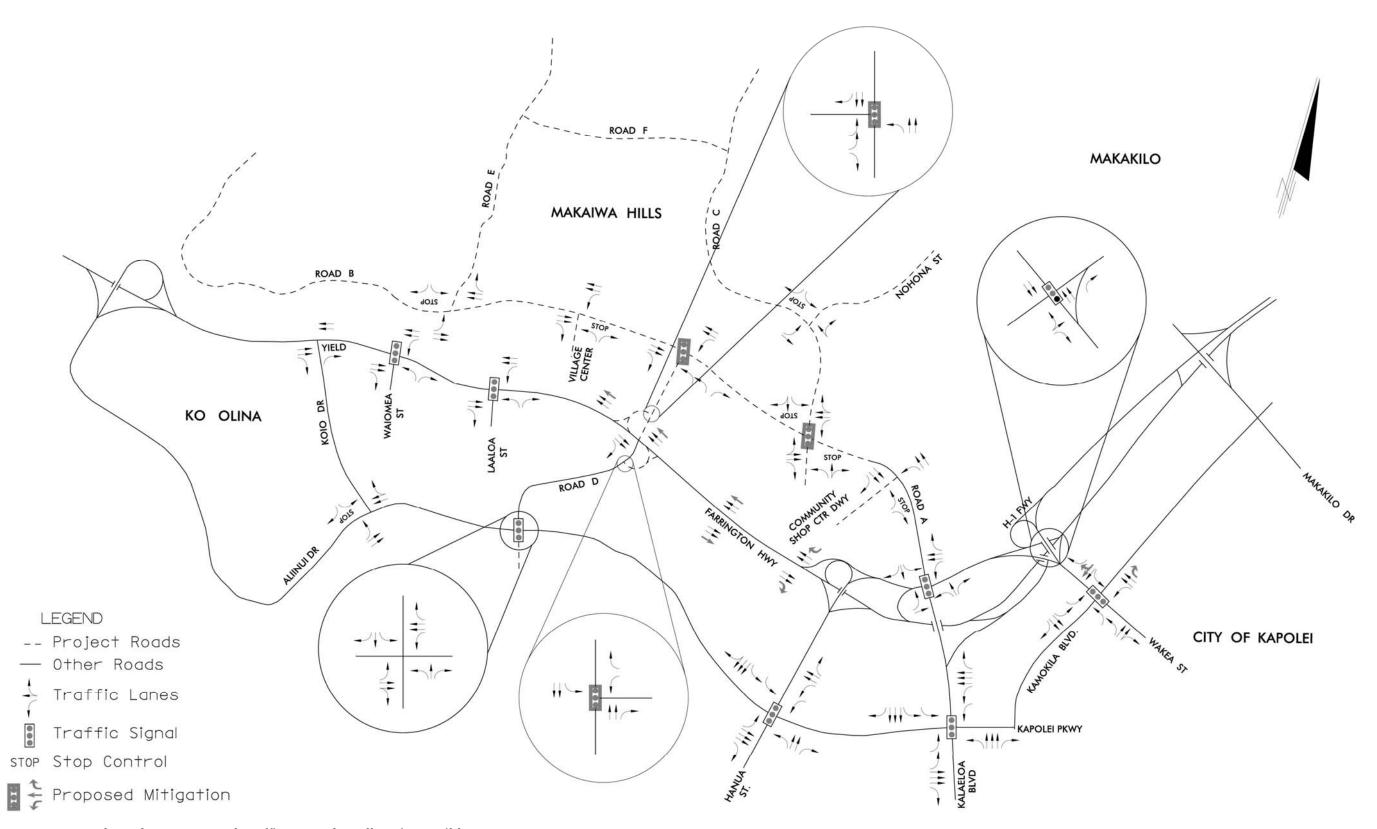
Proposed Roadway Lanes and Traffic Controls, Full Project Build-out
